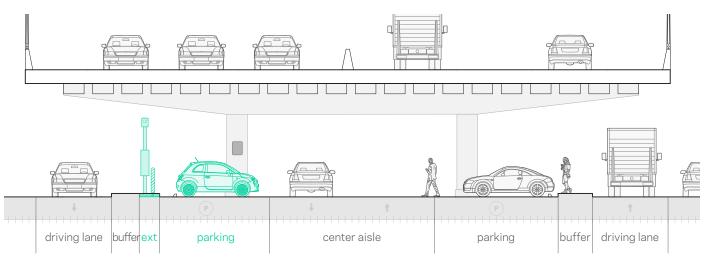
Typical cross-section under the Brookyn-Queens Expressway. EVSE can be installed level with the roadbed or on footing for added protection.
